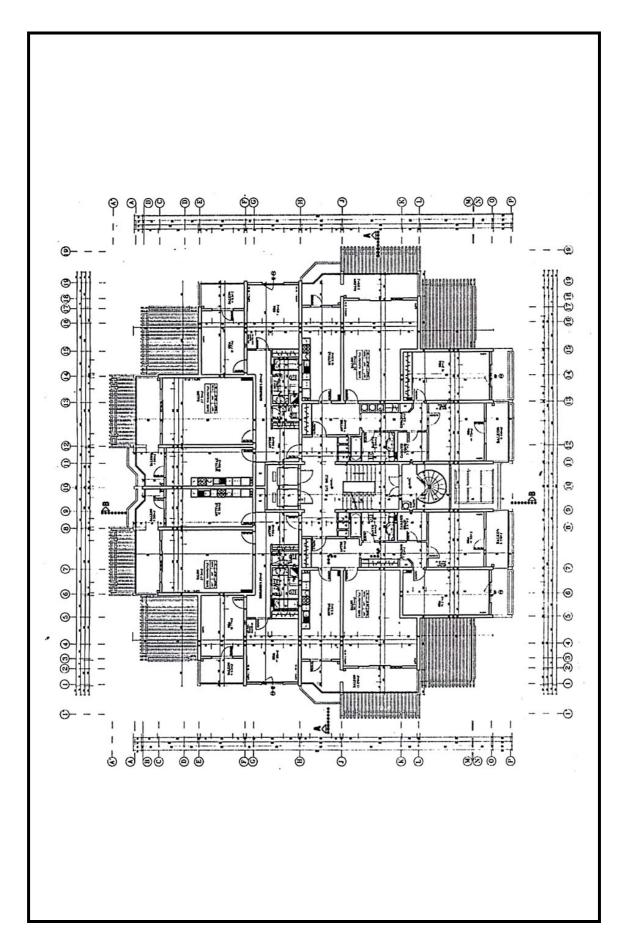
Mavişehir II; Flamingo 18th-Floor Plan
